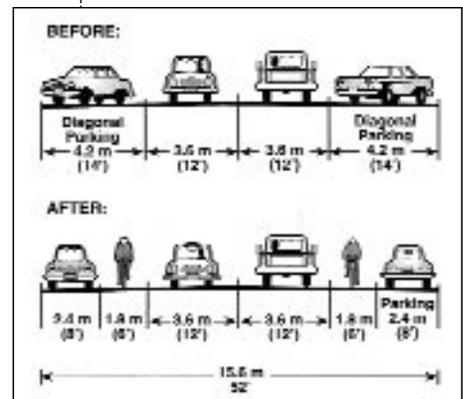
Changing from diagonal to parallel parking on a two-way street.
